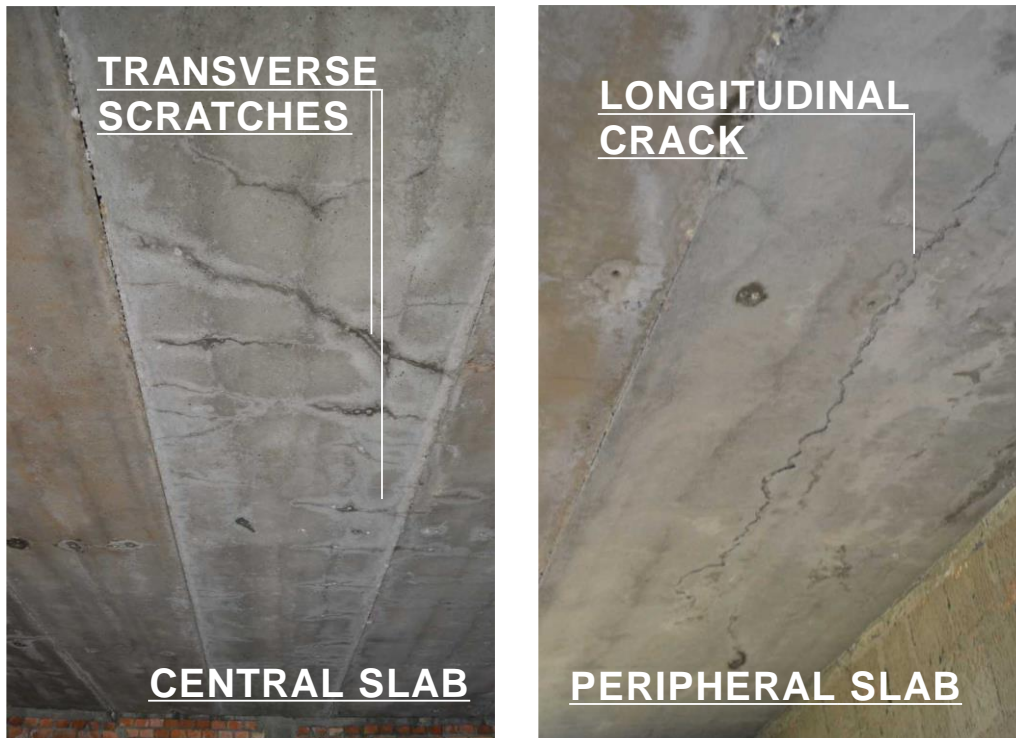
Examples of defects (cracks and scratches) on the bottom surfaces
